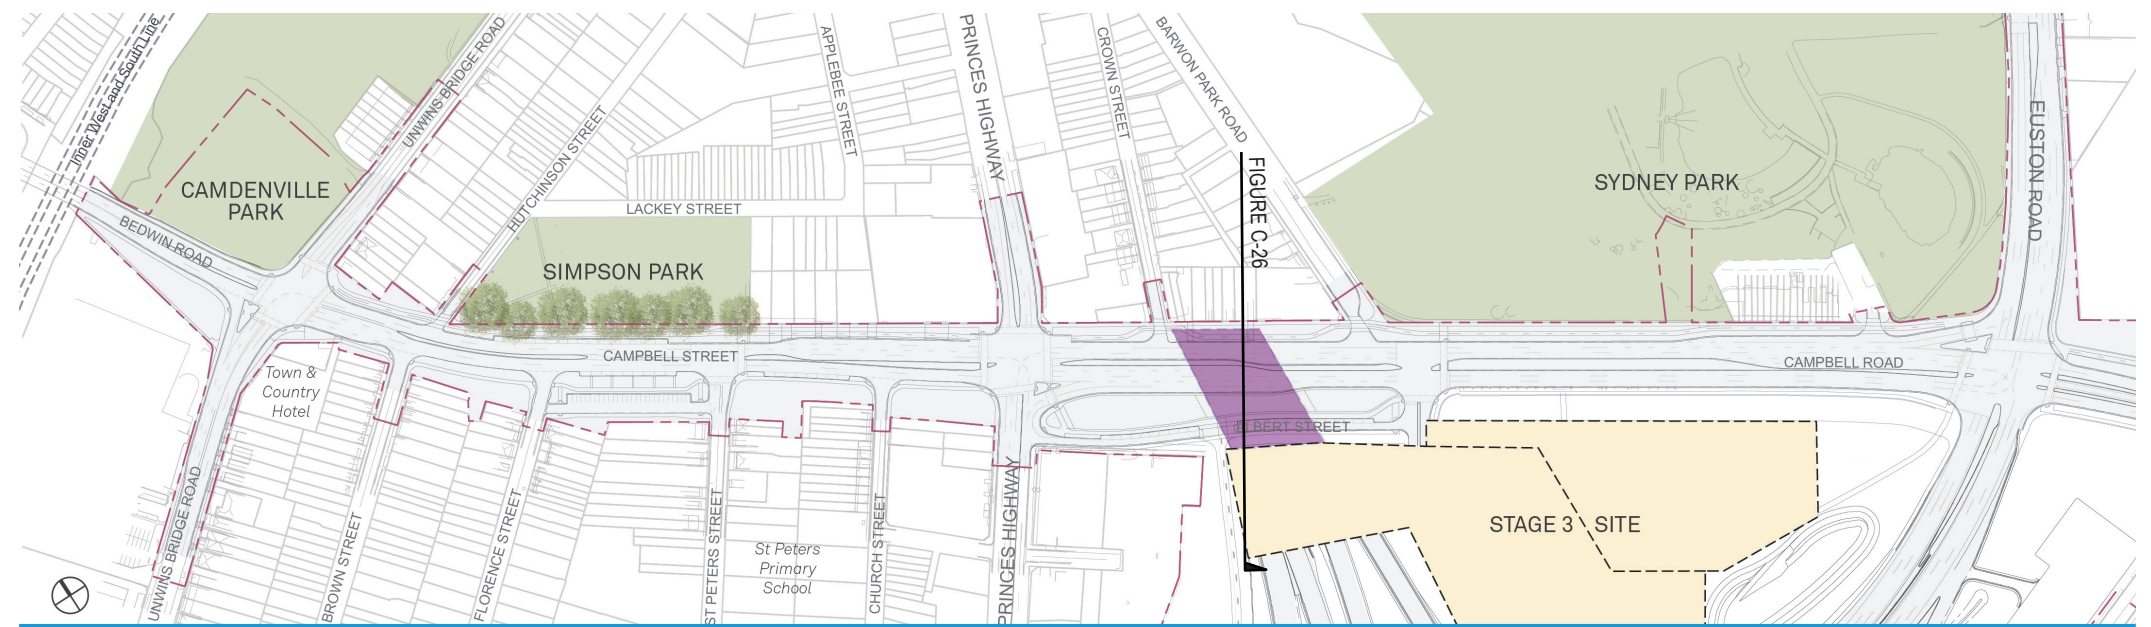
Campbell Street Green Link - Cut and Cover Structure - Plan
